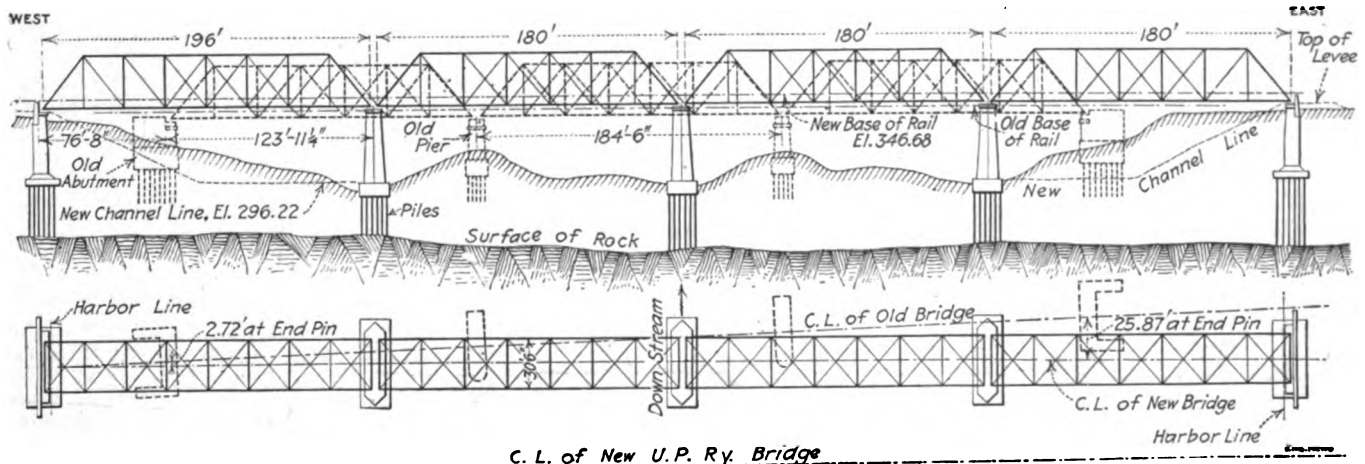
PLAN AND ELEVATION OF THE KAW RIVER BRIDGE OF THE MISSOURI PACIFIC RY. AT KANSAS CITY, KAN.
